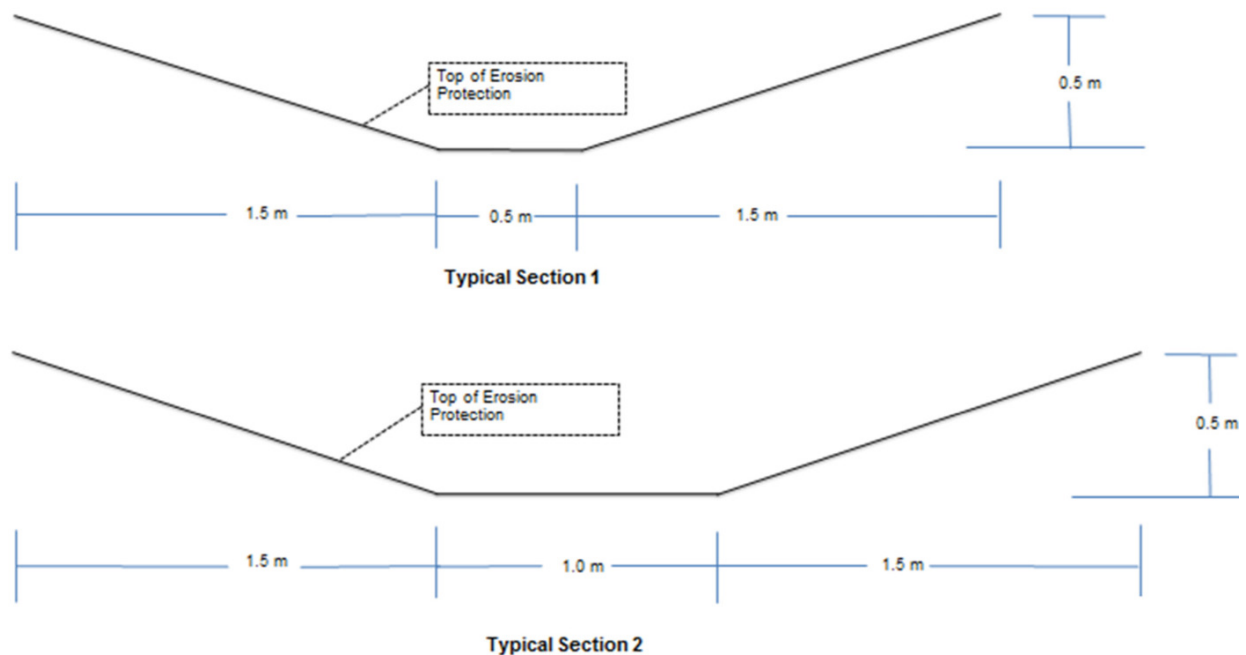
Typical Cross-Sections of the Proposed Drains DW1 to DW 6
